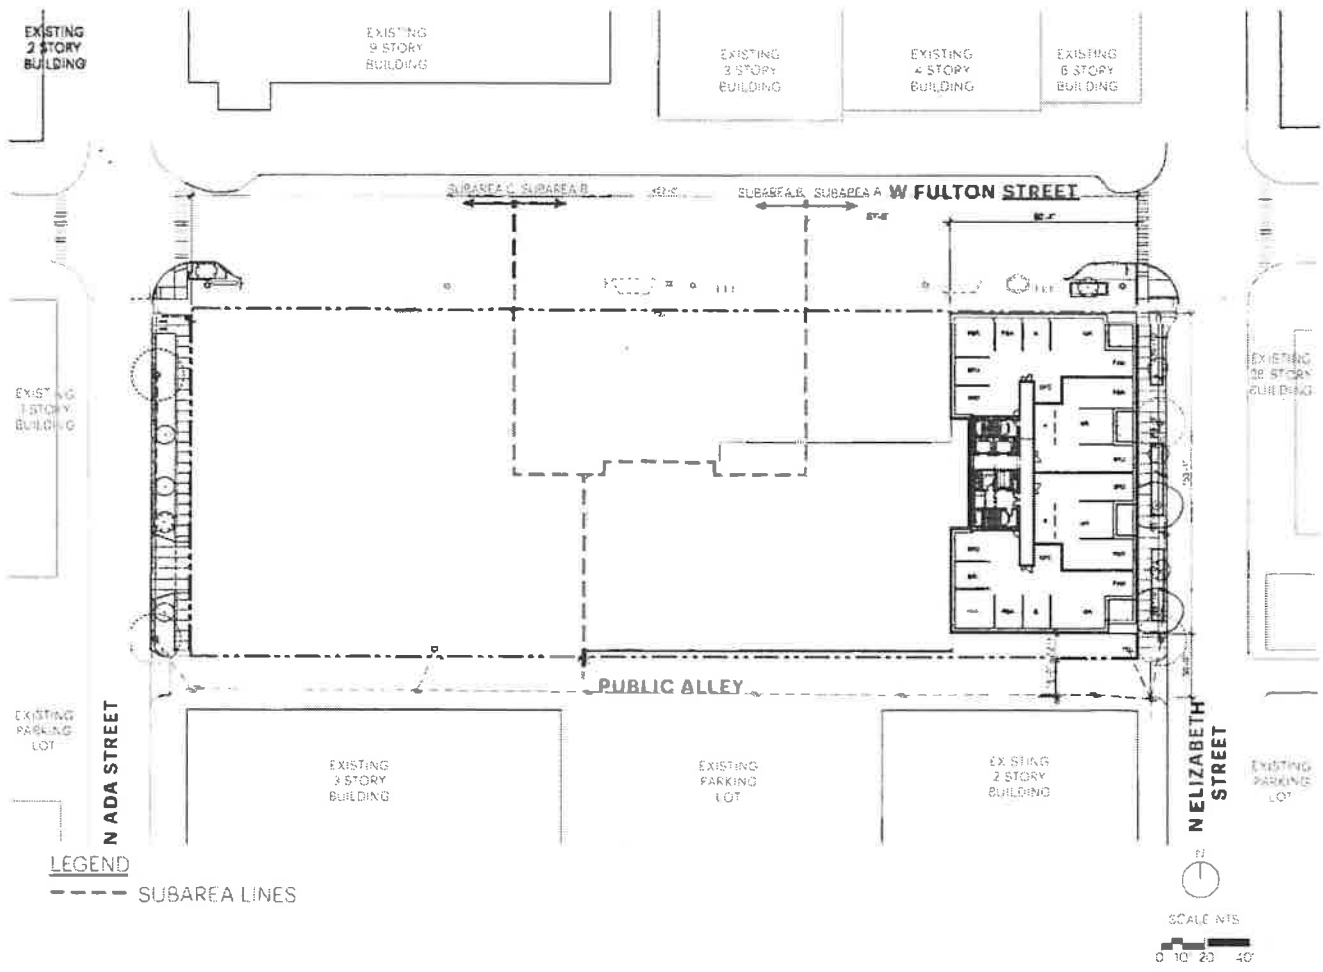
A: TYPICAL PLAN (PHASE I INTERIM CONDITION)
